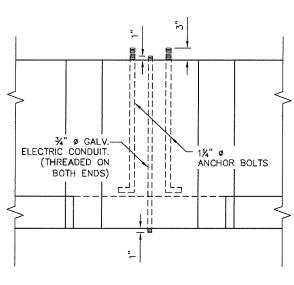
DETAIL OF ANCHOR BOLT & CONDUIT PLACEMENT
